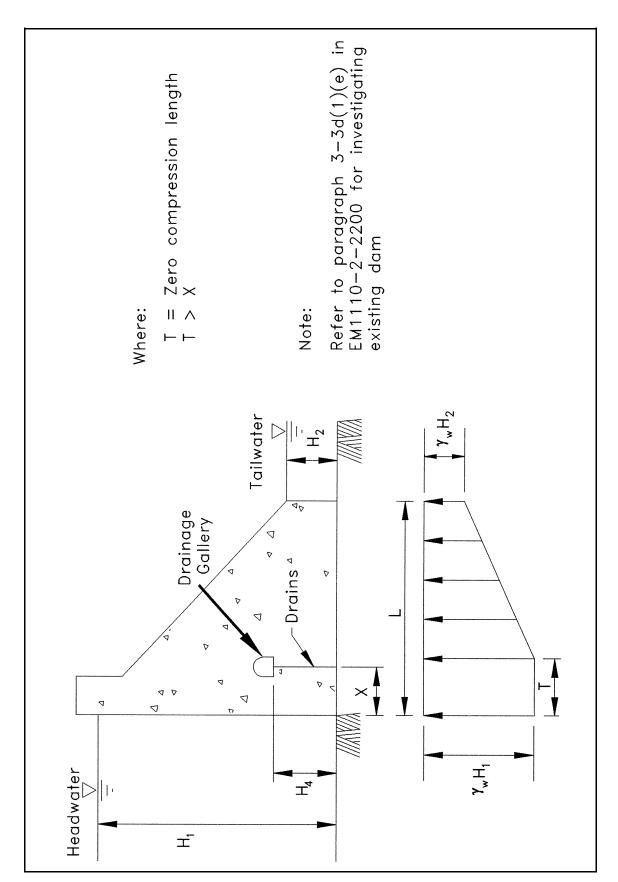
Corps uplift distribution cracked base with drainage, zero compression zone extending beyond drains (Figure 3-5 in EM 1110-2-2200)
